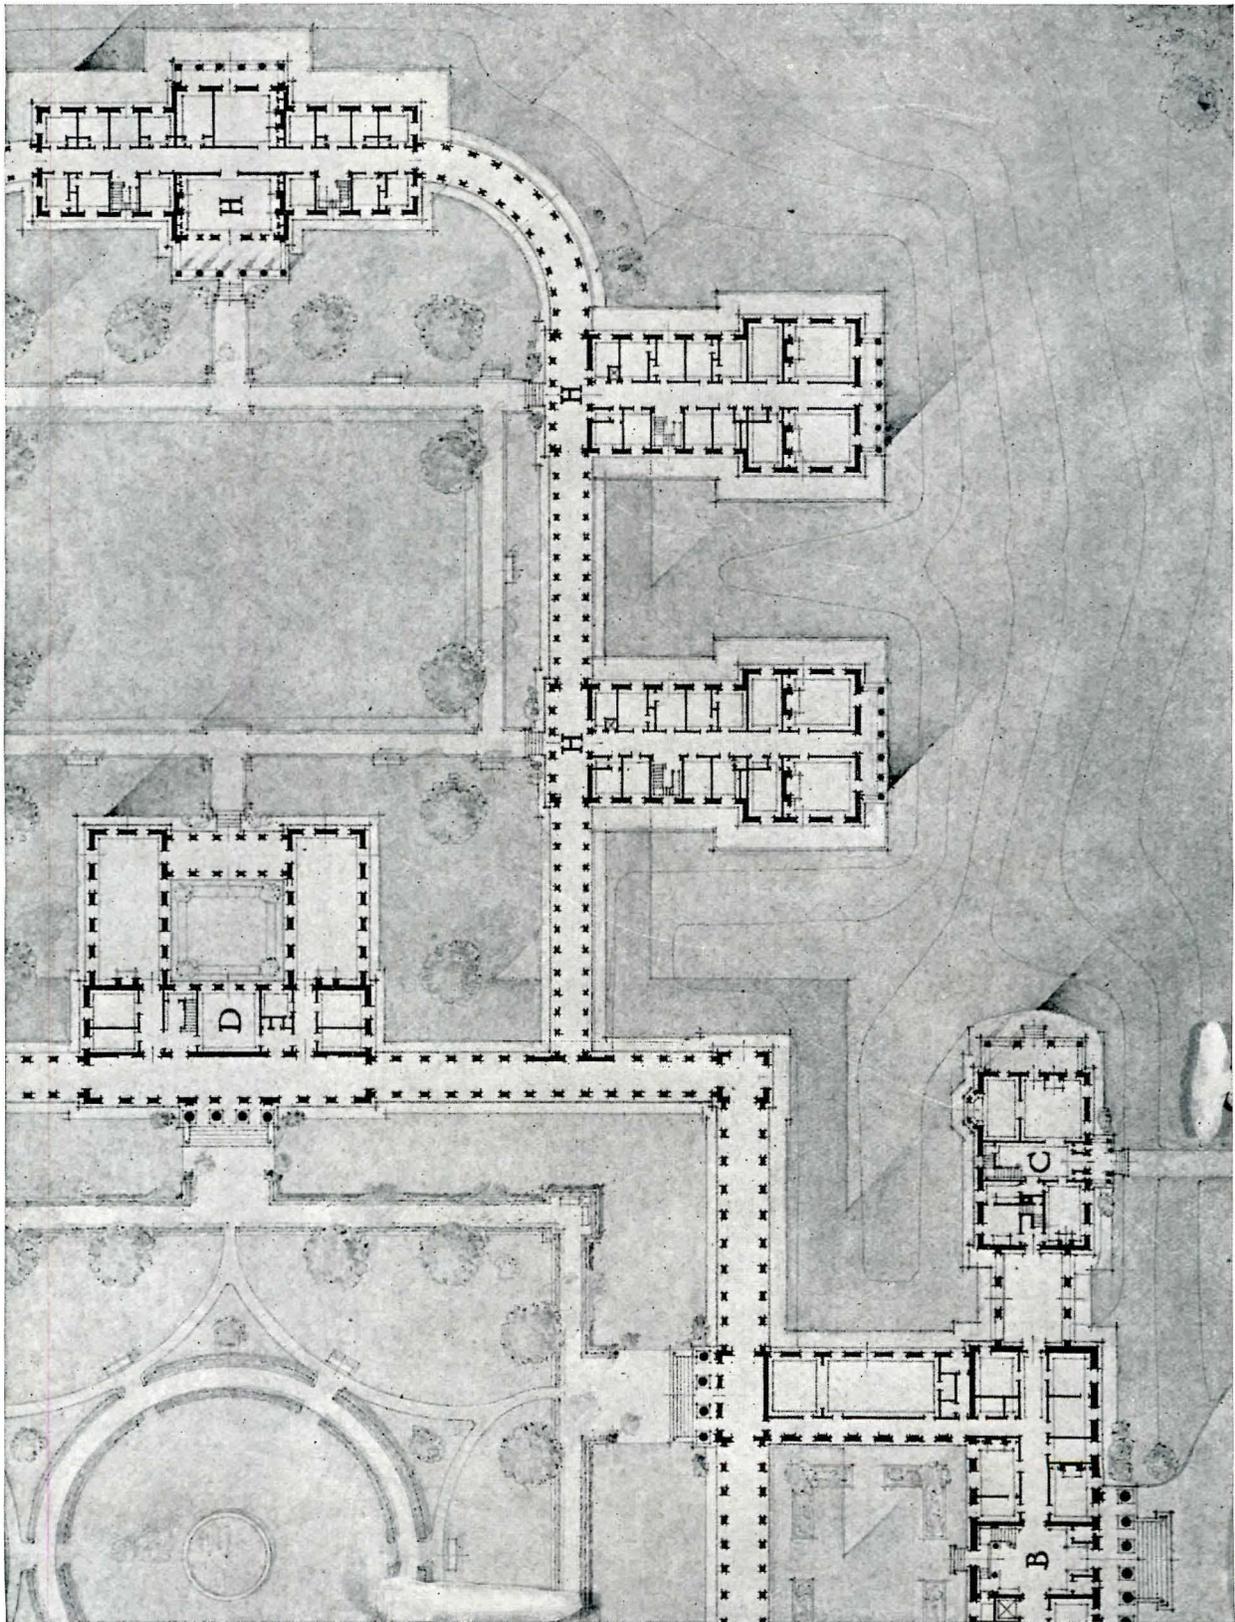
Burke Foundation Buildings and Grounds. A Portion of the Plan Reproduced at Actual Size of the Original Drawing to Show Technique. McKim, Mead & White, Architects.
